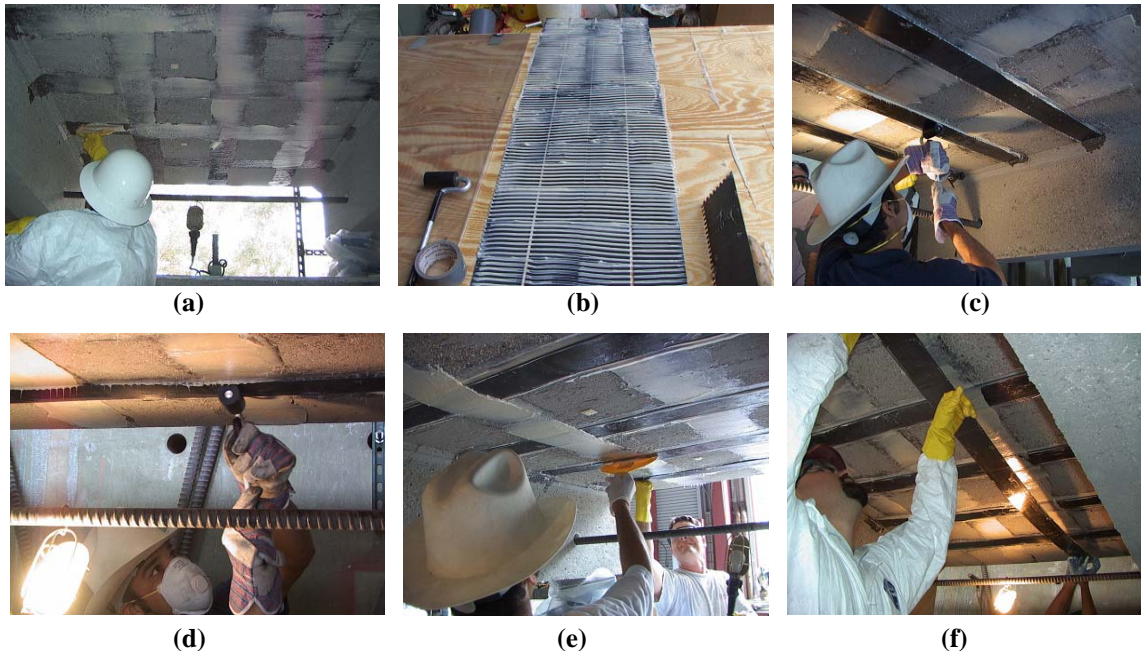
a) Adhesive application on concrete; b) Epoxy application on strips; c) Bonding transverse strip; d) Compaction of composite; e) Epoxy application for longitudinal strips; f) Bonding longitudinal strips
